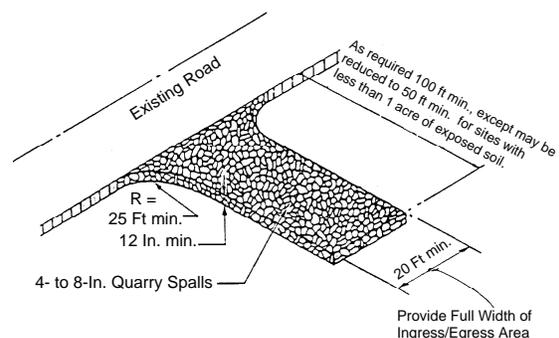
Stabilized construction entrance (from Washington Department of Ecology, 1992).
